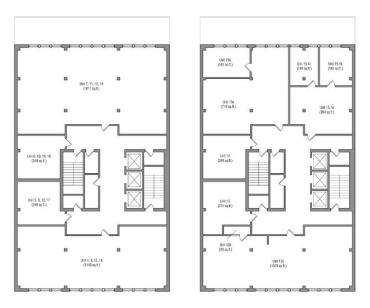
, 299 (left to right): Building 10, fourth floor (1921); same floor (1979). 1'' = 32'. North is up.
